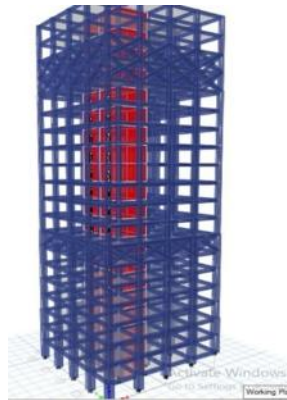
3d view of the building model on a 10-degree hill slope with outrigger system
